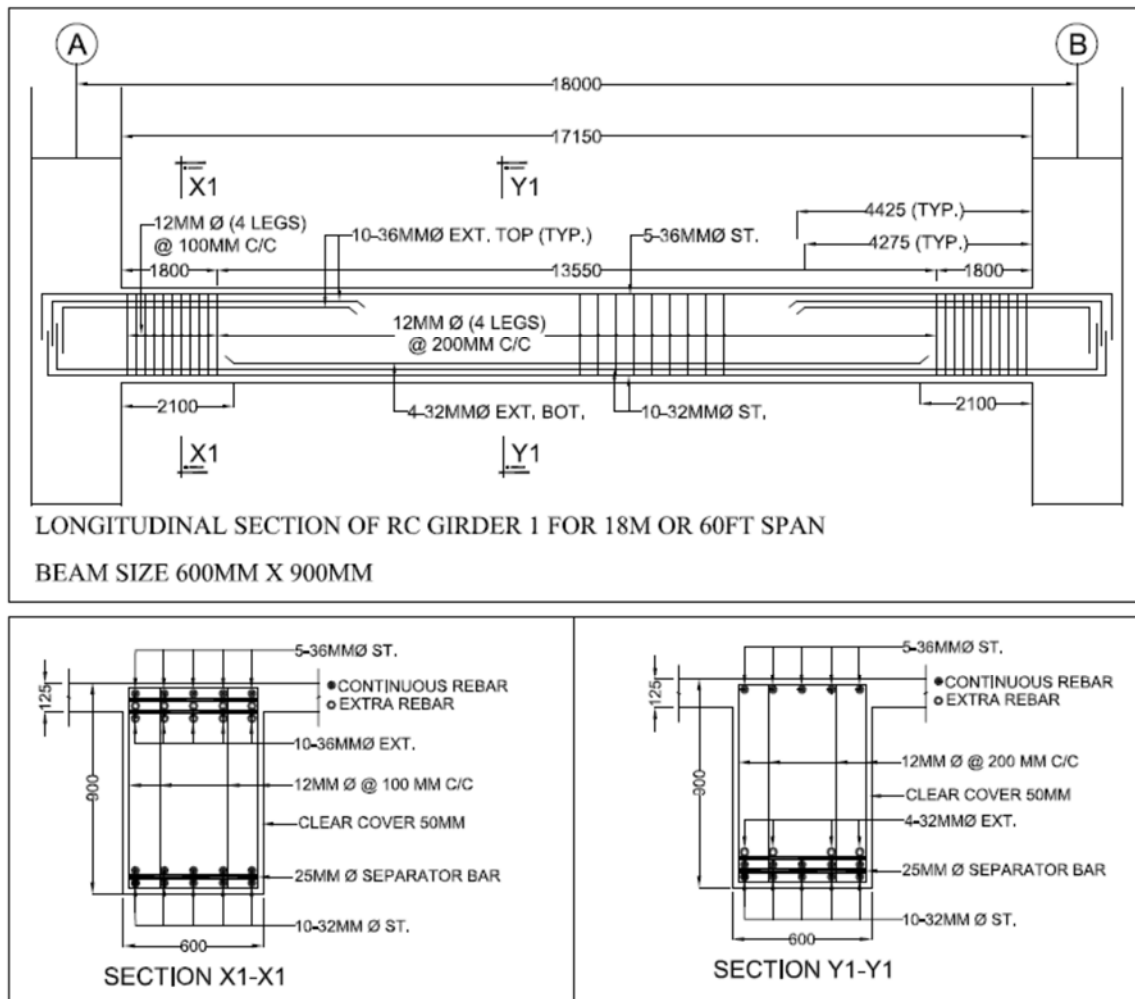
Reinforcement detail of RC beam for 18m (60ft) span
